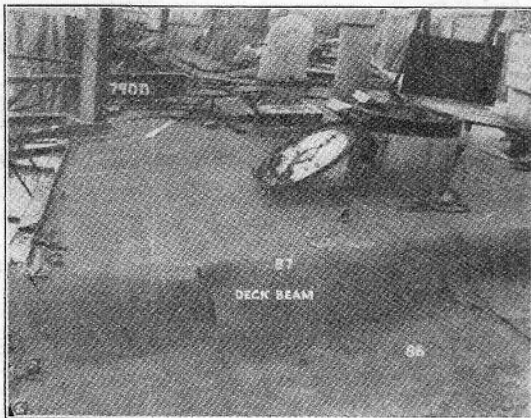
Sagging Test. Details of Buckling of Starboard Deck Stringer Plate, Frames 86-88, showing Position of Deck Beam 87 in Wrinkled Plating.
